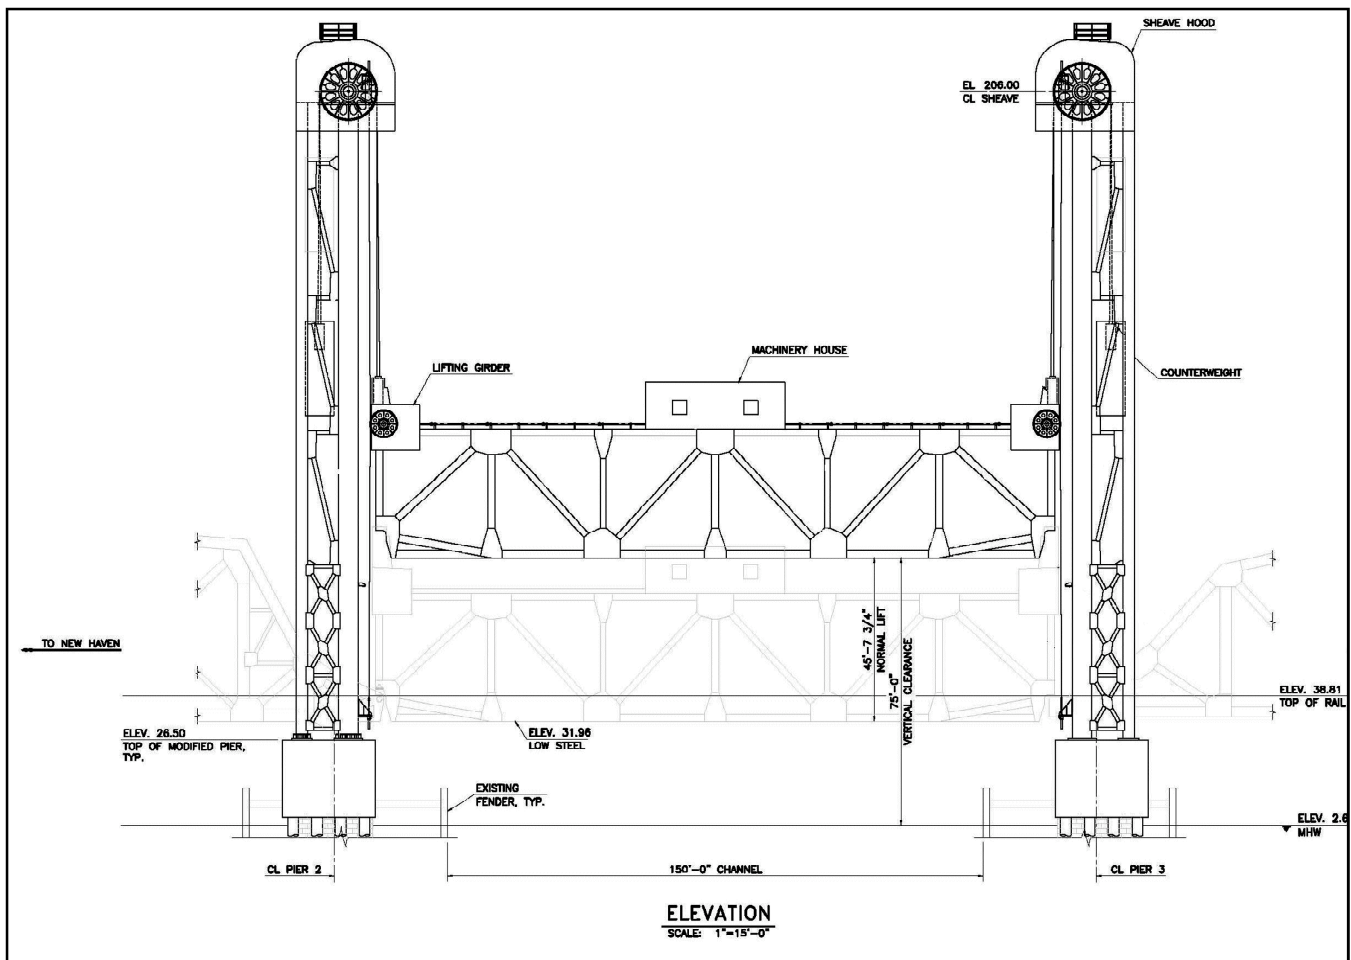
Elevation of the new lift span, Groton Bridge (Howard, Needles, Tammen & Bergendoff (HNTB), Groton Connecticut, Bridge 124.09 Over Thames River, Replacement of Movable Span. General Machinery Layout, Sheet No. 133, September 15, 2005. On file, Amtrak Engineering Archives, Philadelphia, PA).
